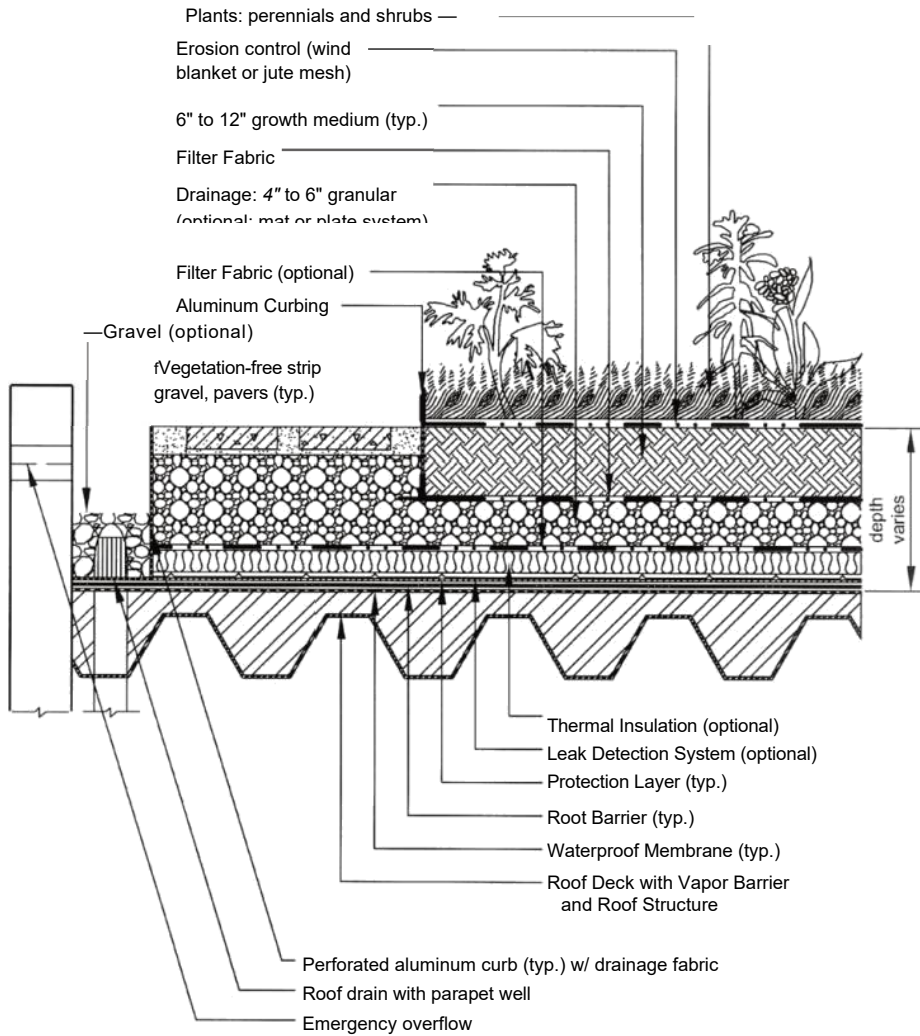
Typical Section – Extensive Vegetated Roof
